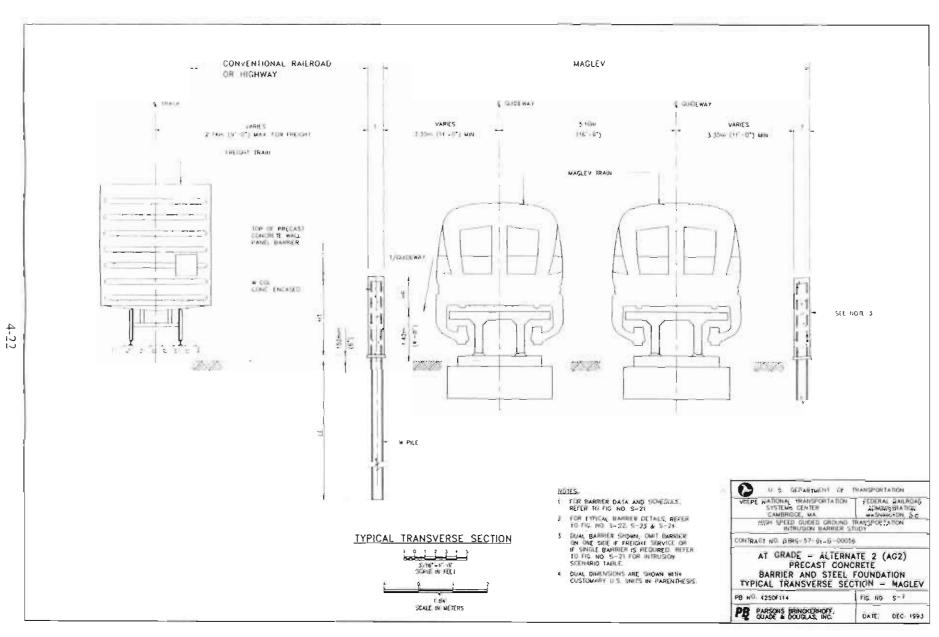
AT GRADE ALTERNATE 2: P/C WALL AND STEEL FOUNDATION - TRANSVERSE SECTION/MAGLEV
